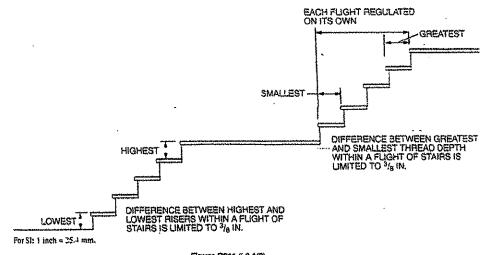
(2) STAIR TOLERANCES
